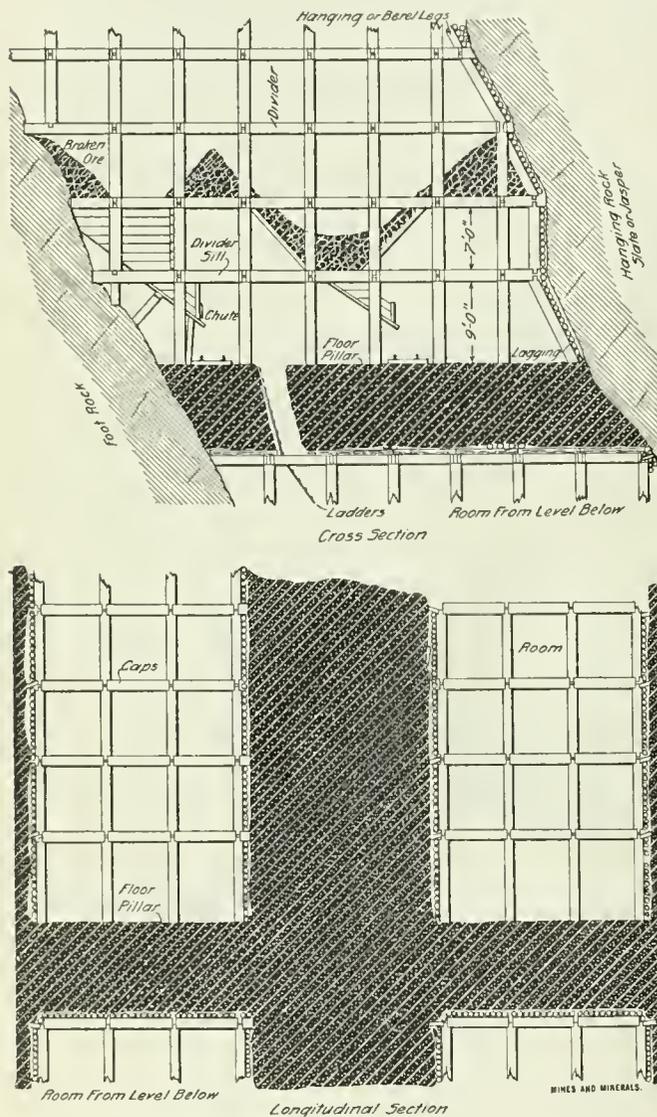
VERTICAL SECTIONS SHOWING SQUARE SET TIMBERING AND SCHEME OF MINING
